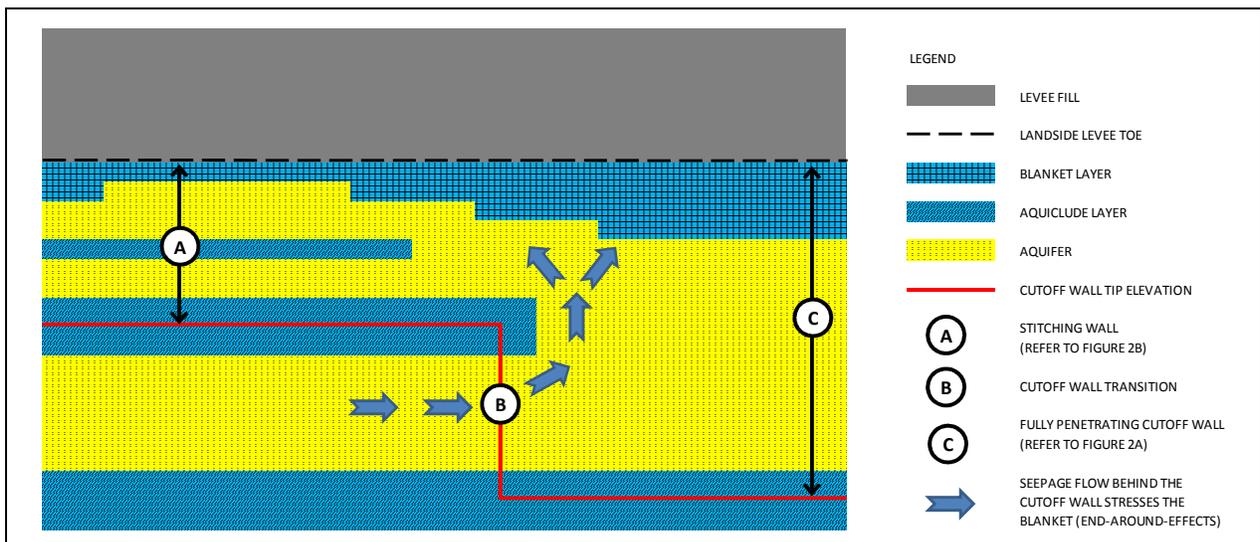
Typical Longitudinal Profile Through Levee Crown
